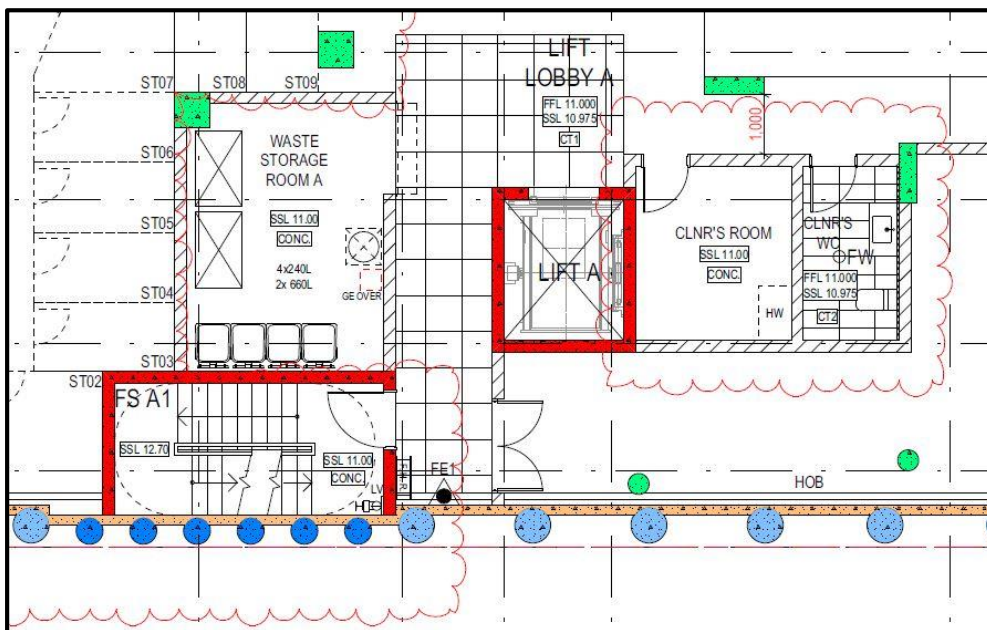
Proposed Basement Level 1 – portion showing Lift Core A, waste storage room, modified fire stairs and amended bulky goods storage comprising cleaner's room and water closet
